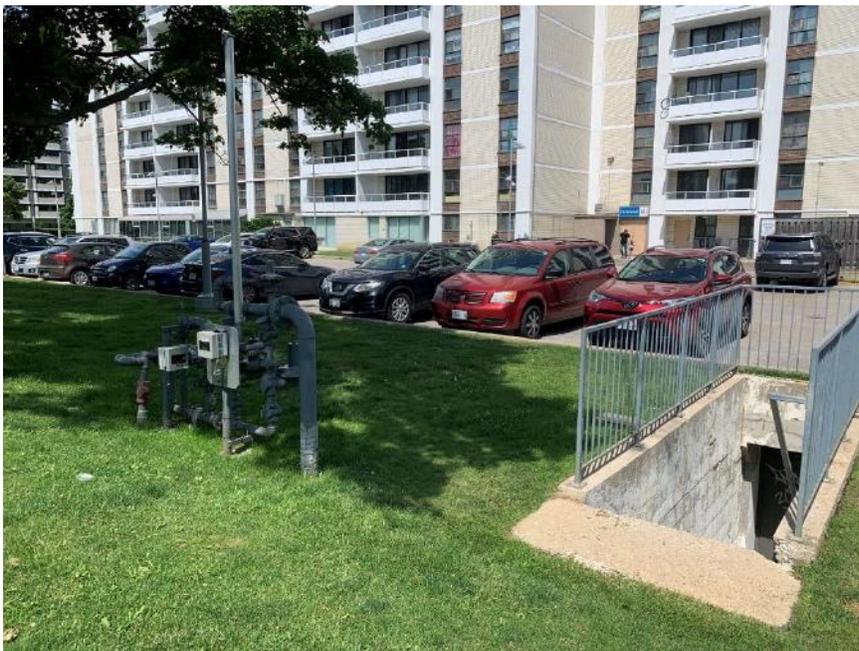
View of landscaped lawn, underground utilities and parking garage entrance at 7 St. Dennis Drive.
